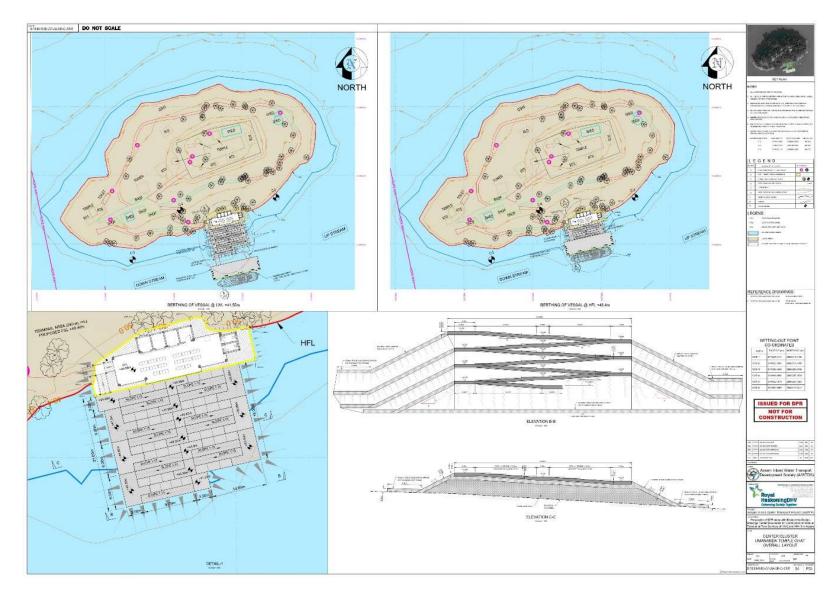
Proposed Layout of Umananda Ghat Terminal including Pontoon Linkspan and Sloping Access
